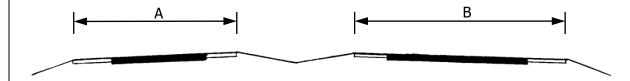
Cross-section view of two approach roadways that are carried across one bridge.
